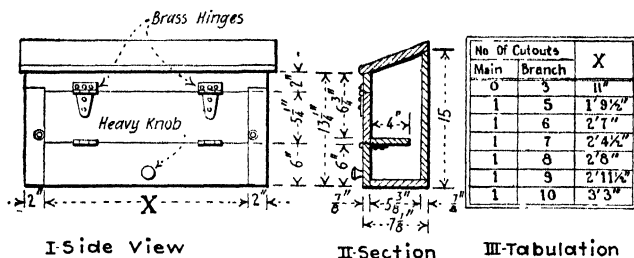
Wooden switch and cut out cabinet for damp places. (F. G. Waldenfels.)
